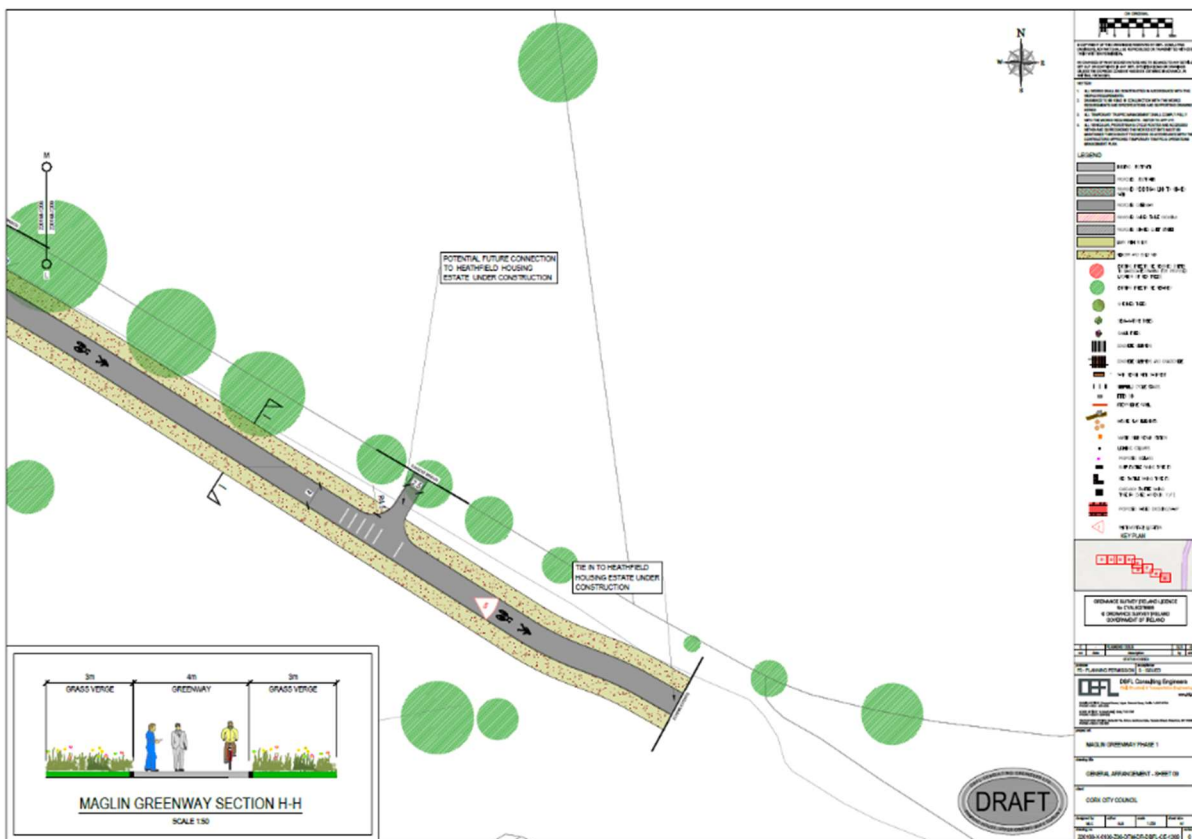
Proposed Route Detail 9 – Alignment through agricultural lands (Gaeolscoil Uí Ríordáin located to the north) and new Heathfield housing area (partly under construction) to the north-west.
